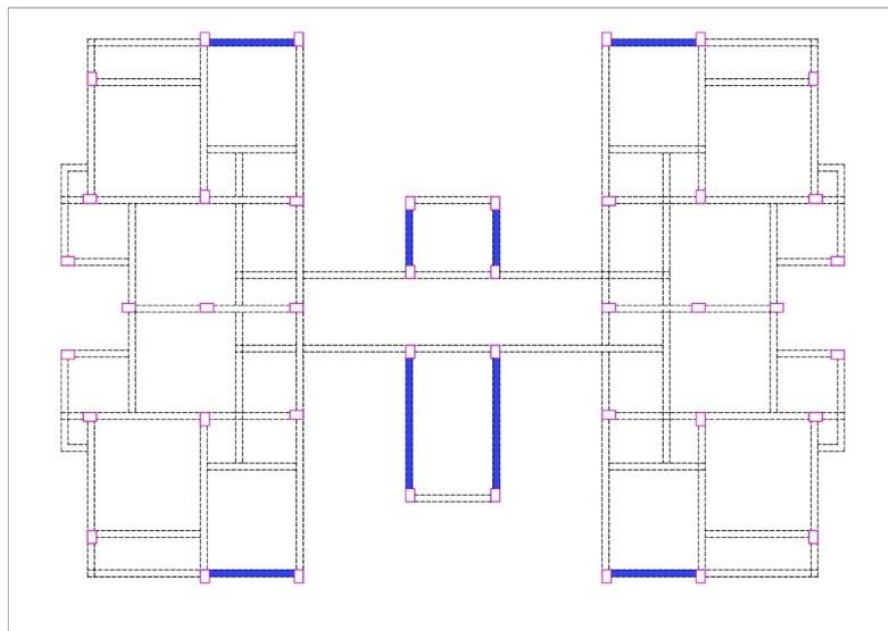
(b): Model 5 – Plan highlighting the location of Steel Bracing.
